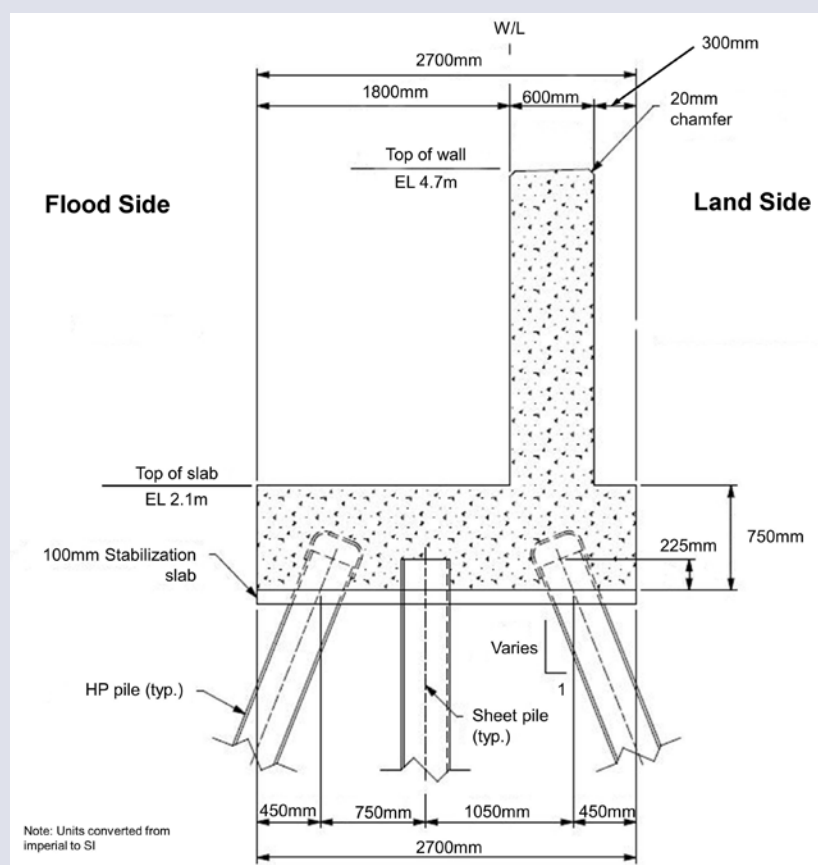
Typical T-wall cross-section in LPV 105 (courtesy Barry Fehl/URS)
